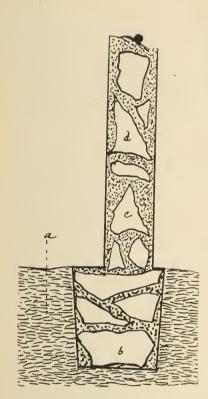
End section of a bad foundation and a poorly constructed concrete wall. Note the foundation resting on the soil A, instead of the soil on the foundation, as in Fig. 1, the wall placed on one side of the foundation, and the wedge-shaped stones C and D, tending to split the wall.
